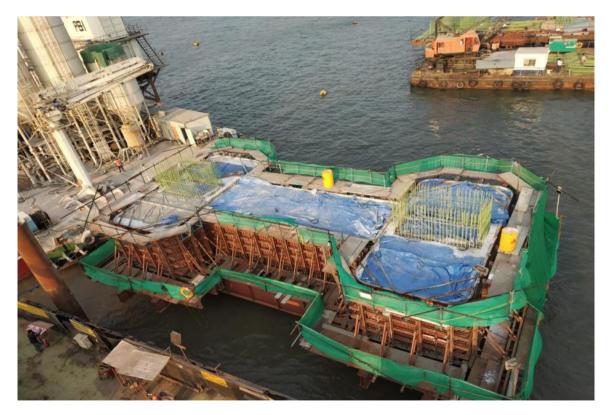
MP 104 Pile Cap Concreting- Marine Area
